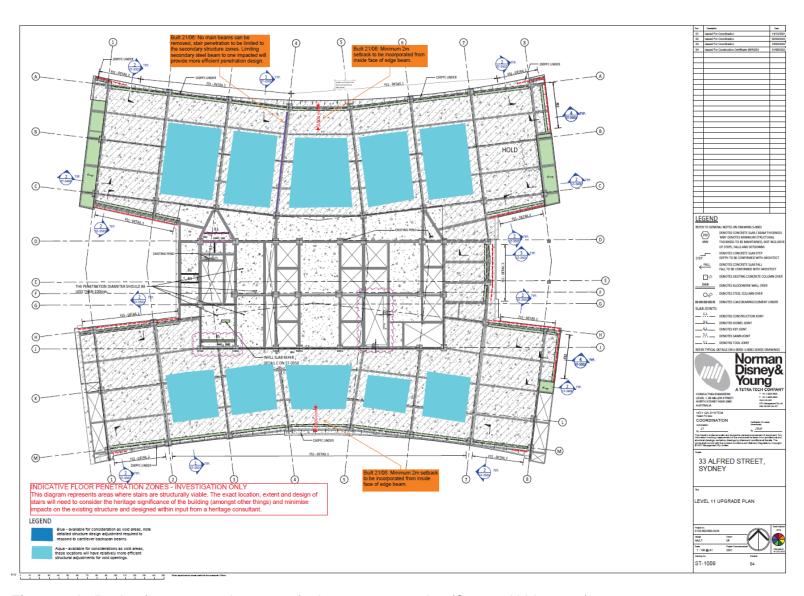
Indicative floor penetration zones for inter-tenancy stairs. (Source: Urbis, 2024)
